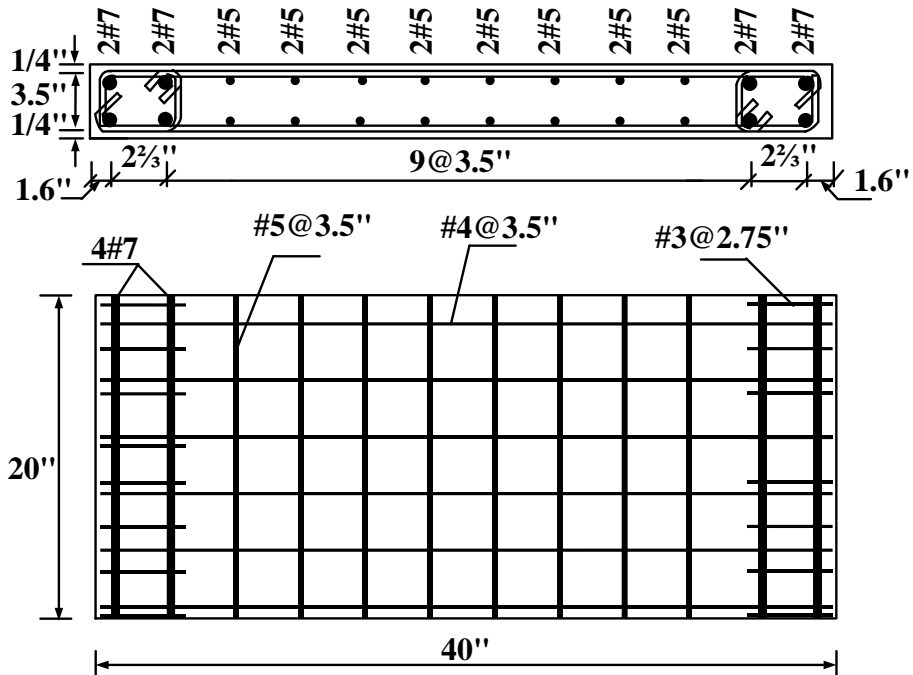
Top and side views of shear wall reinforcement for SW-HA-0.5.
